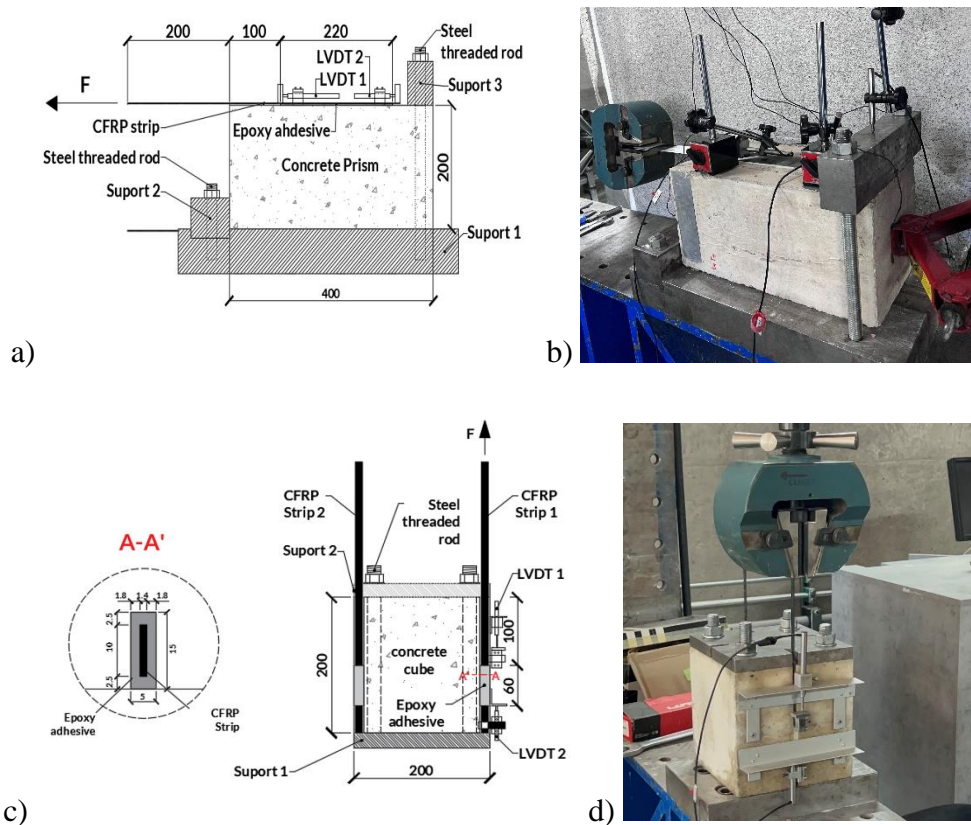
Pull-out tests: (a) specimen's geometry and test configuration (EBR), (b) photograph of the test (EBR), (c) specimen's geometry and test configuration (NSM), and (d) photograph of the test (NSM). Note: all units in [mm].
